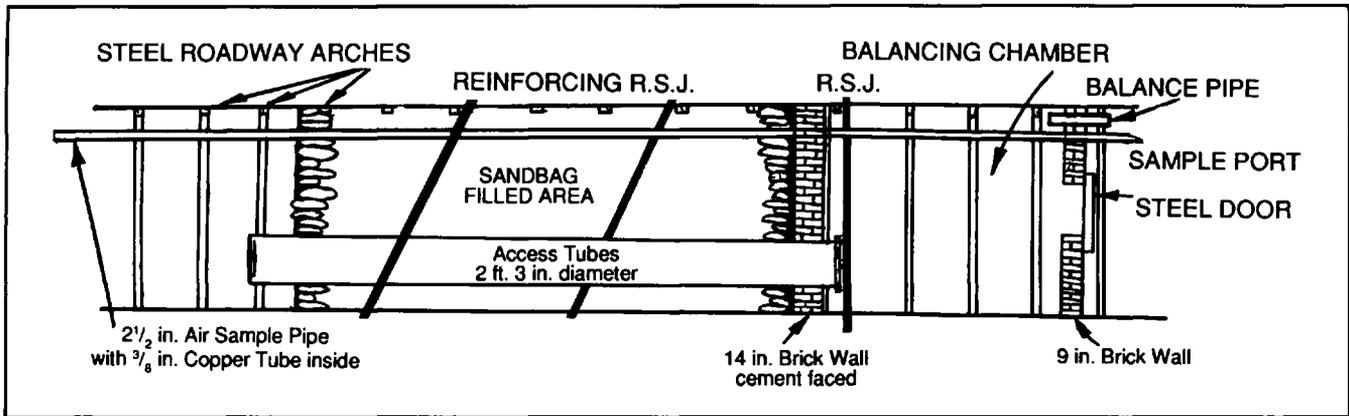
Explosion-proof sandbag stopping with Butterley steel access tubes.
